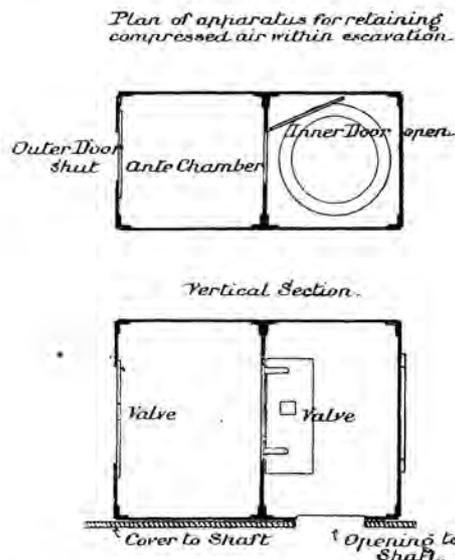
COCHRANE'S SYSTEM OF TUNNELING BY COMPRESSED AIR.
